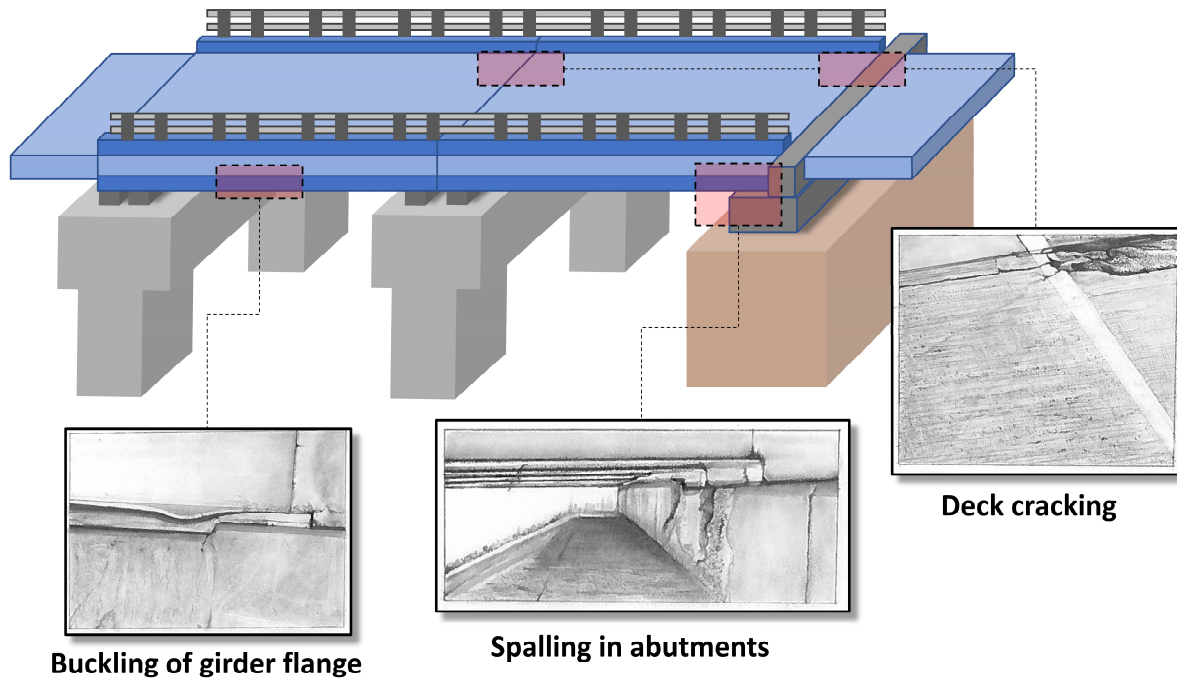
Potential bridge damages caused by the combination of clogged joint condition and unpredicted thermal stresses
